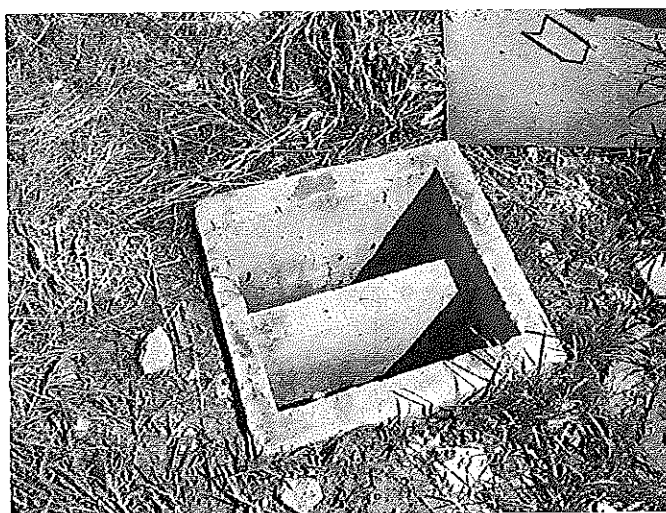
An Oil Trap System Constructed at the Outlet of the Drain
